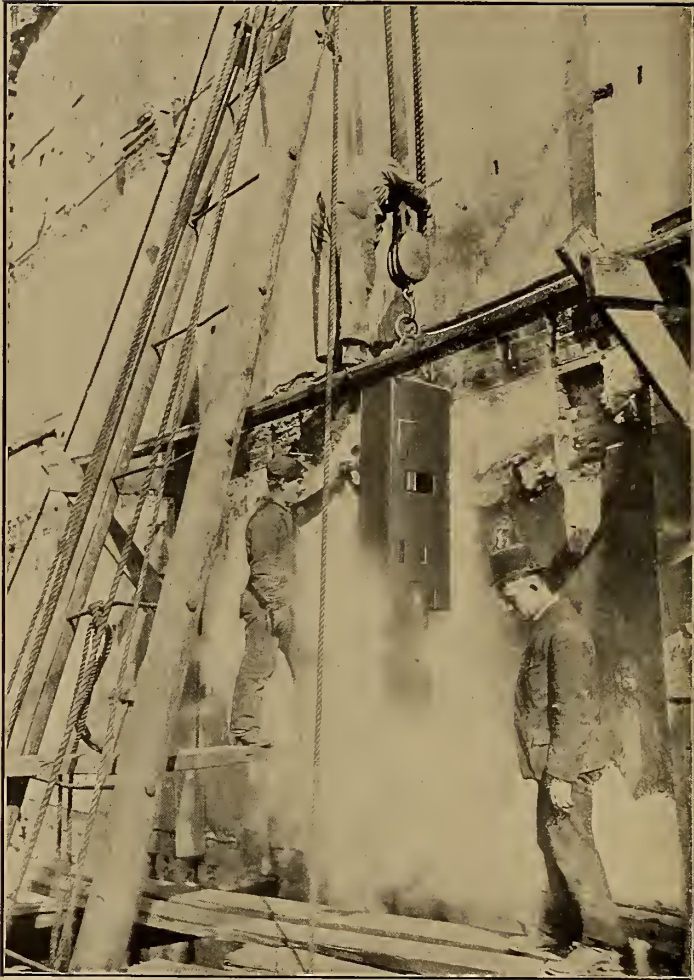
ARNOTT STEAM PILE HAMMER SUSPENDED FROM DERRICK FOR DRIVING STEEL SHEET PILING. UNION IRON WORKS, HOBOKEN
